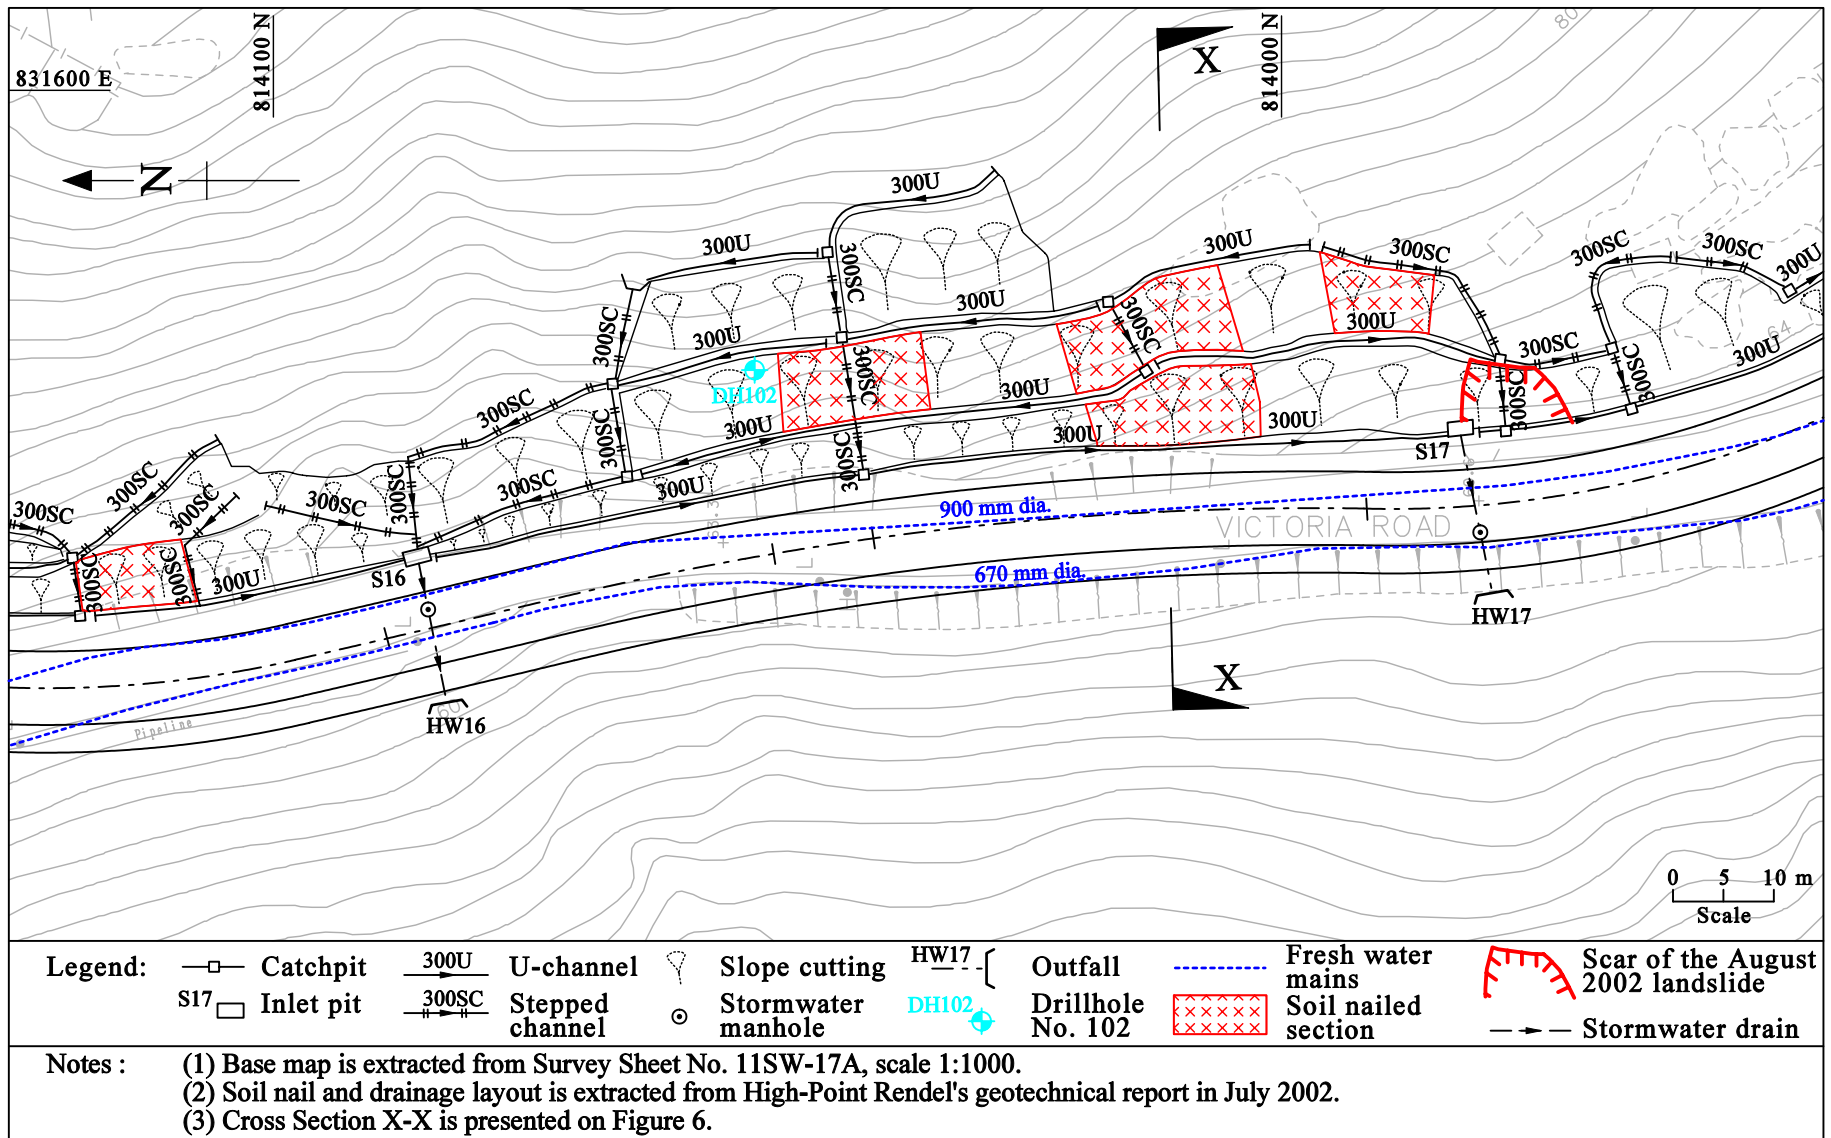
General Layout Plan of Drainage Provisions and Soil Nailing Works in the July 2002 Geotechnical Report
